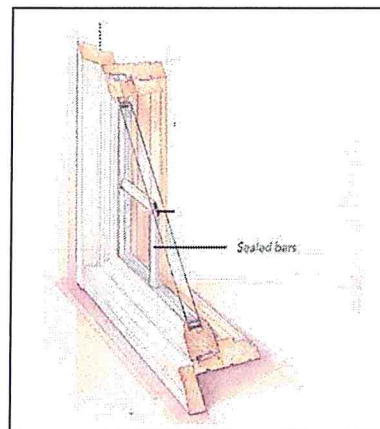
Window Detailing – Trim and casement location and dimensions
